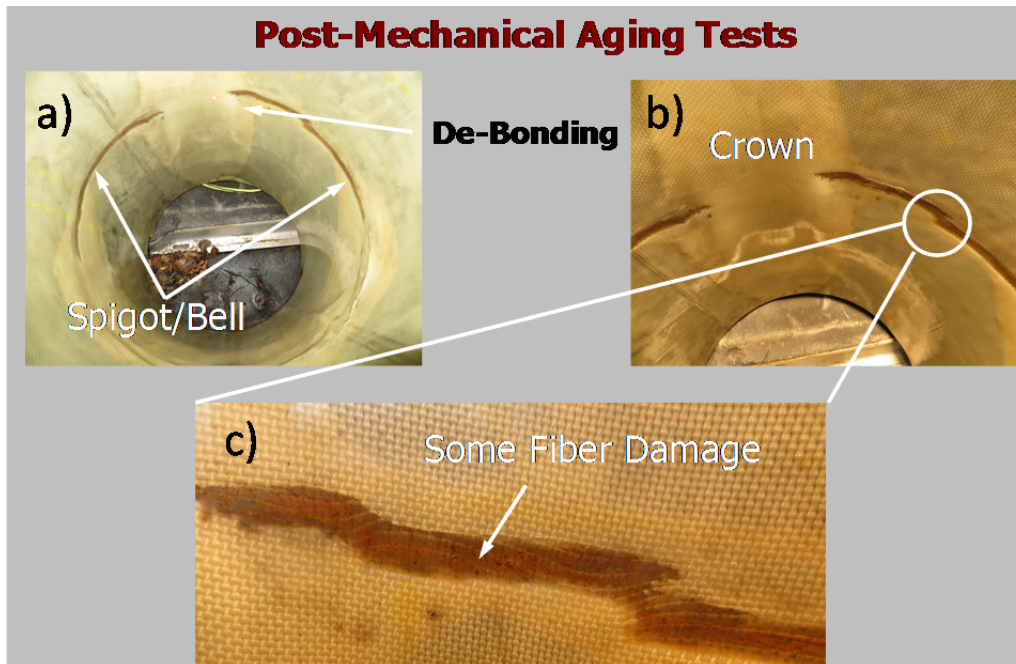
Inspection of Specimen 12-2 after All Mechanical Aging Tests
